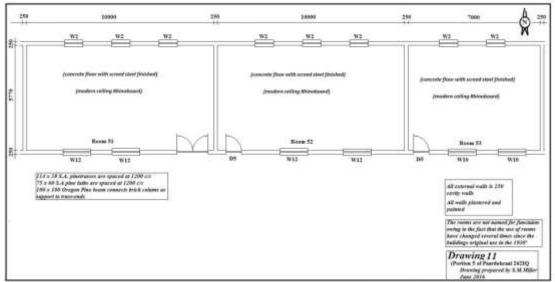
Above. Layout of rooms 51 to 53. (Drawing S.M. Miller 2016.)
